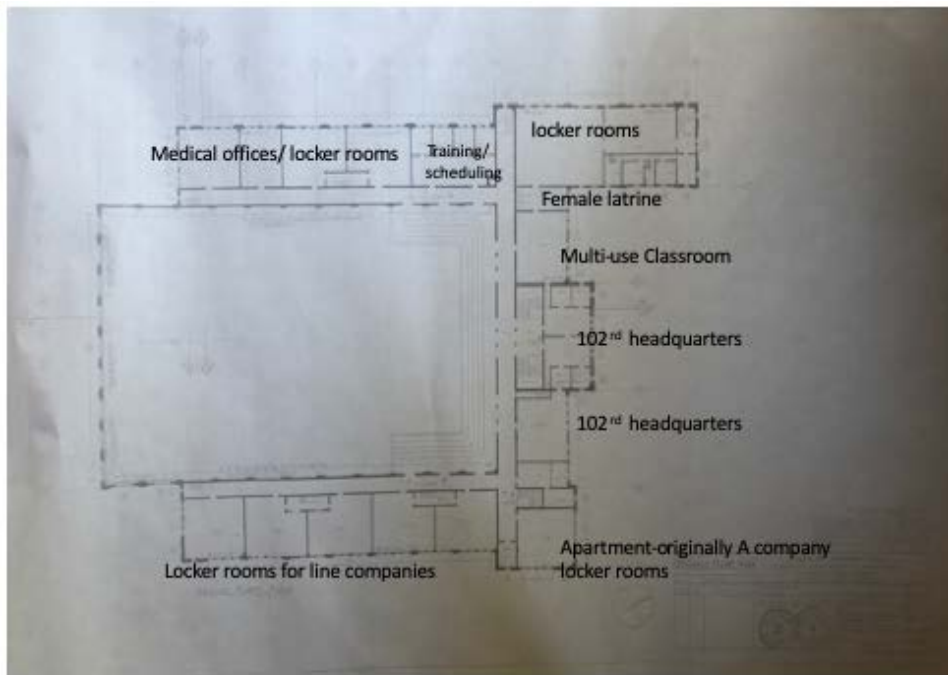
Plan of Building Layout, historic room use. Drawing of Third (labeled Second) floor, Sapienza and Lessig Architects and Planners, Bureau of Public Works, State of Connecticut, February 21, 1986.
